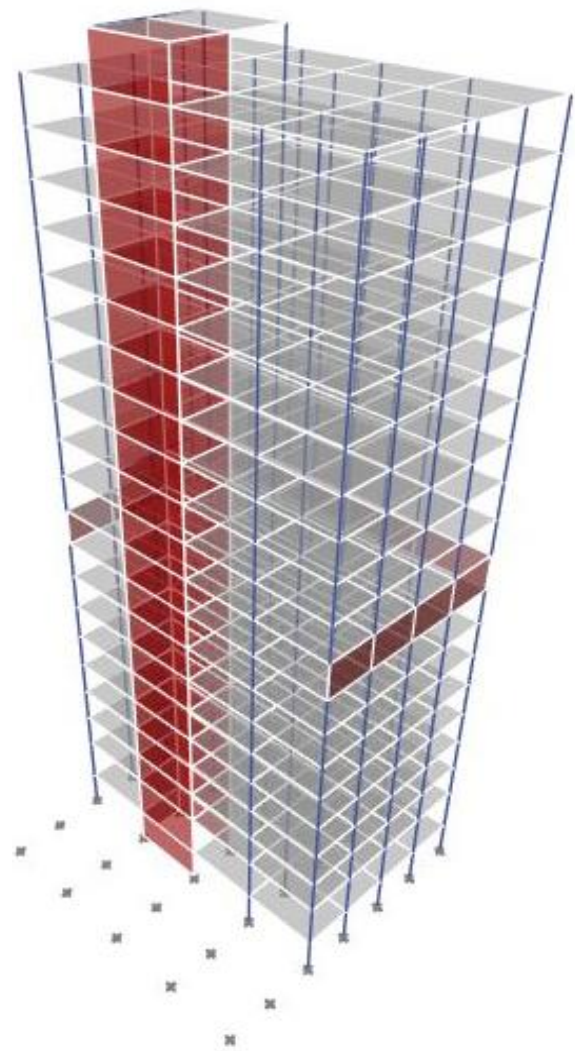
Sectional 3D View of the Structure with Wall Belt at corners
